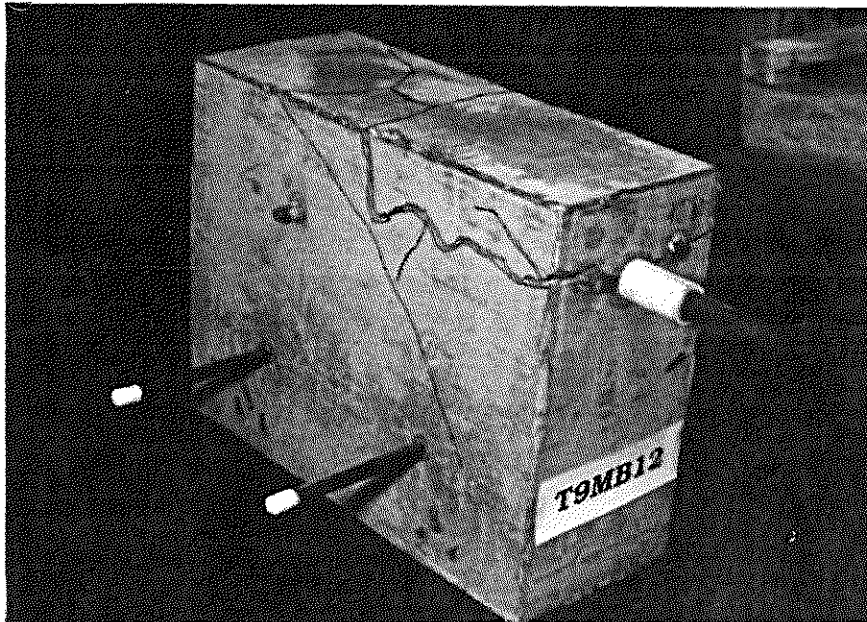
Beam-end test specimen with 3 in. cover, without transverse reinforcement, after failure
